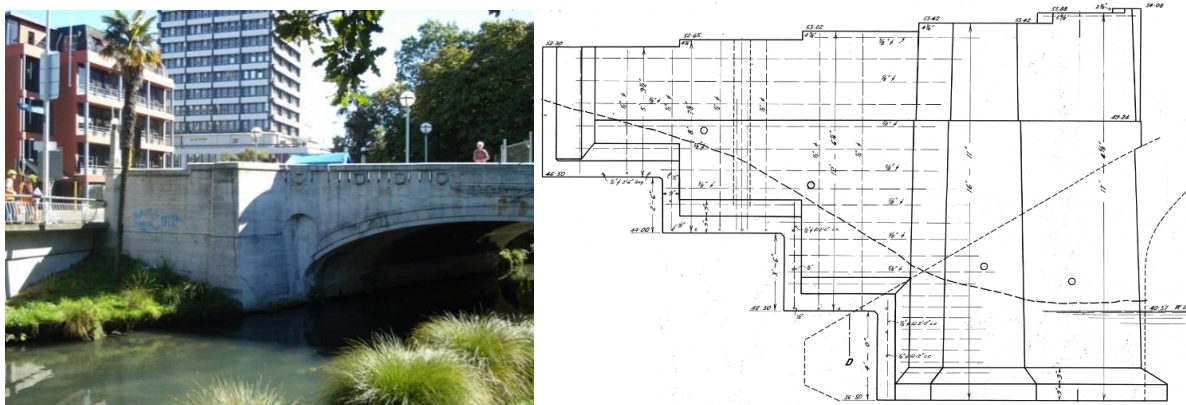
Remembrance Bridge arch structure and abutment/foundation plan
